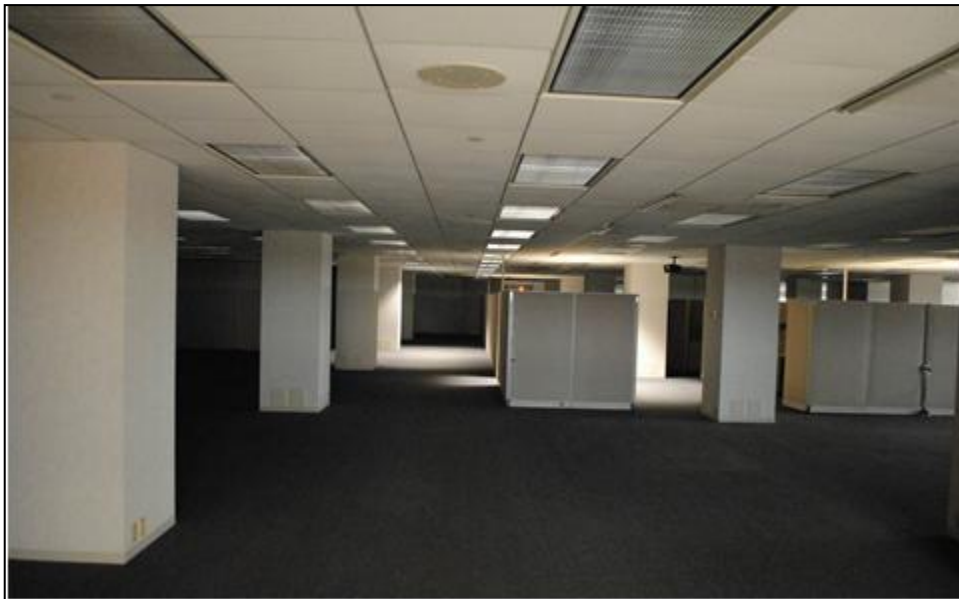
Interior view of an upper story office space in Building 18, looking north.
